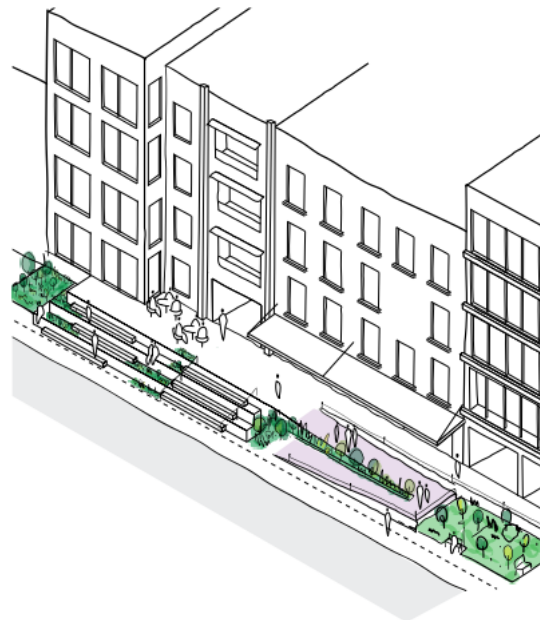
Elements such as terracing, seating, landscape bridge the visual gap between the elevated ground and street level and contribute to the activity and attractiveness of the streetscape.
